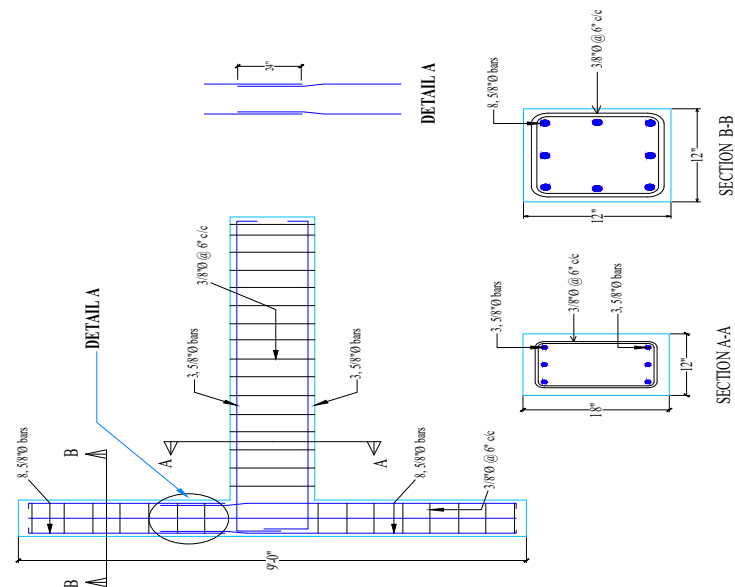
Geometric and reinforcement details of substandard beam-column joint
